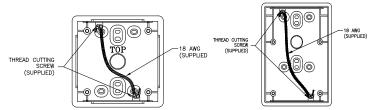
Surface Backbox E50SB (left) and E50SSB (right)
